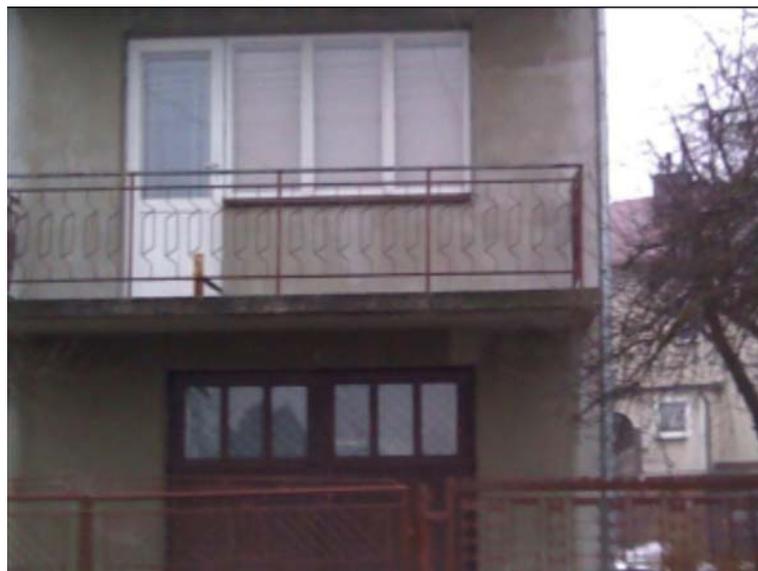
Digital photo of the west elevation of the 1st building [authors resources]
